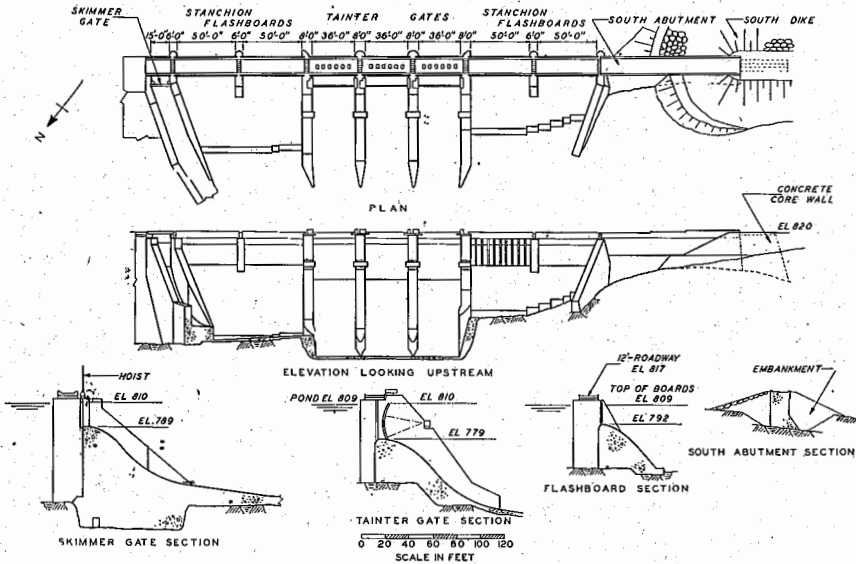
SPILLWAY—PLAN, ELEVATION, AND SECTIONS.
